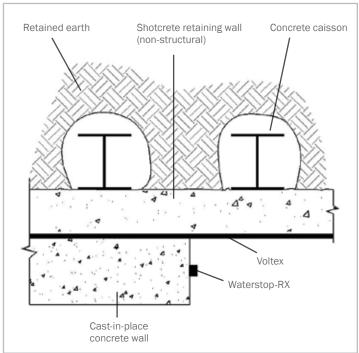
Grout void area and remove protrusions to provide smooth Figure 2.17 - Earth formed concrete retention wall with surface for Voltex.
